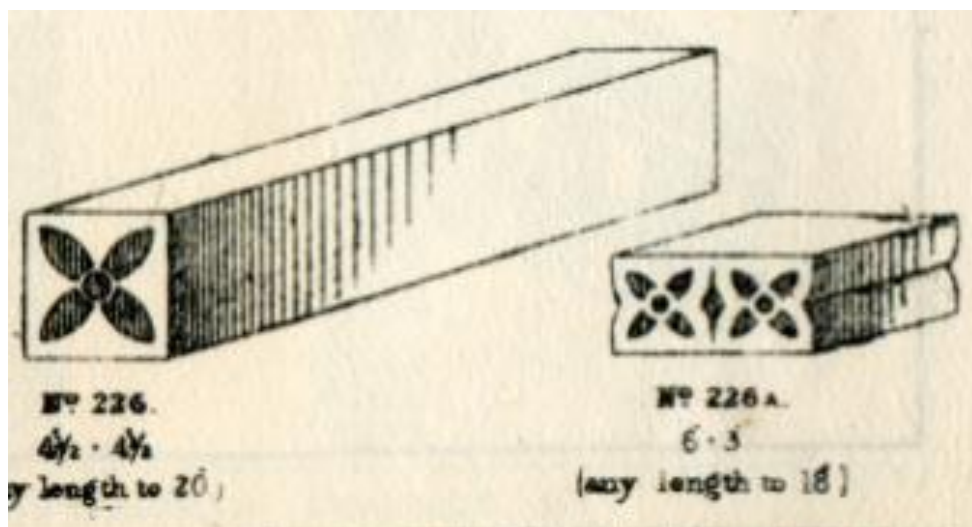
Moulded bricks for ventilation can be seen at eaves level on the Jennings houses.
